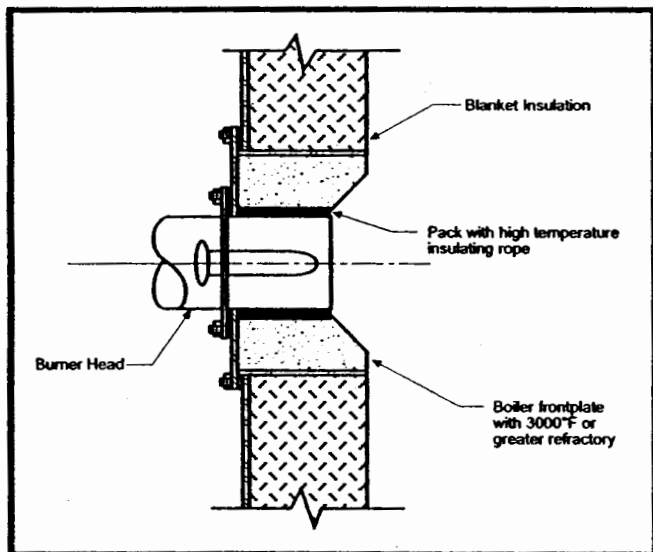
Frontplate Installation with Blanket Insulated Boiler
